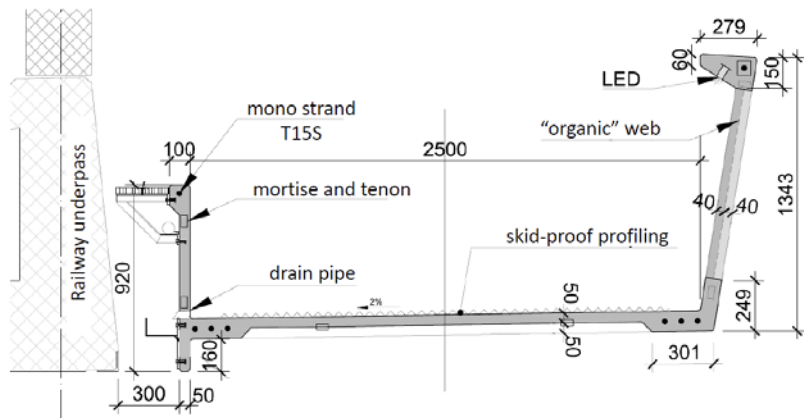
Martinet Footbridge: asymmetric cross section (dimensions in mm).
